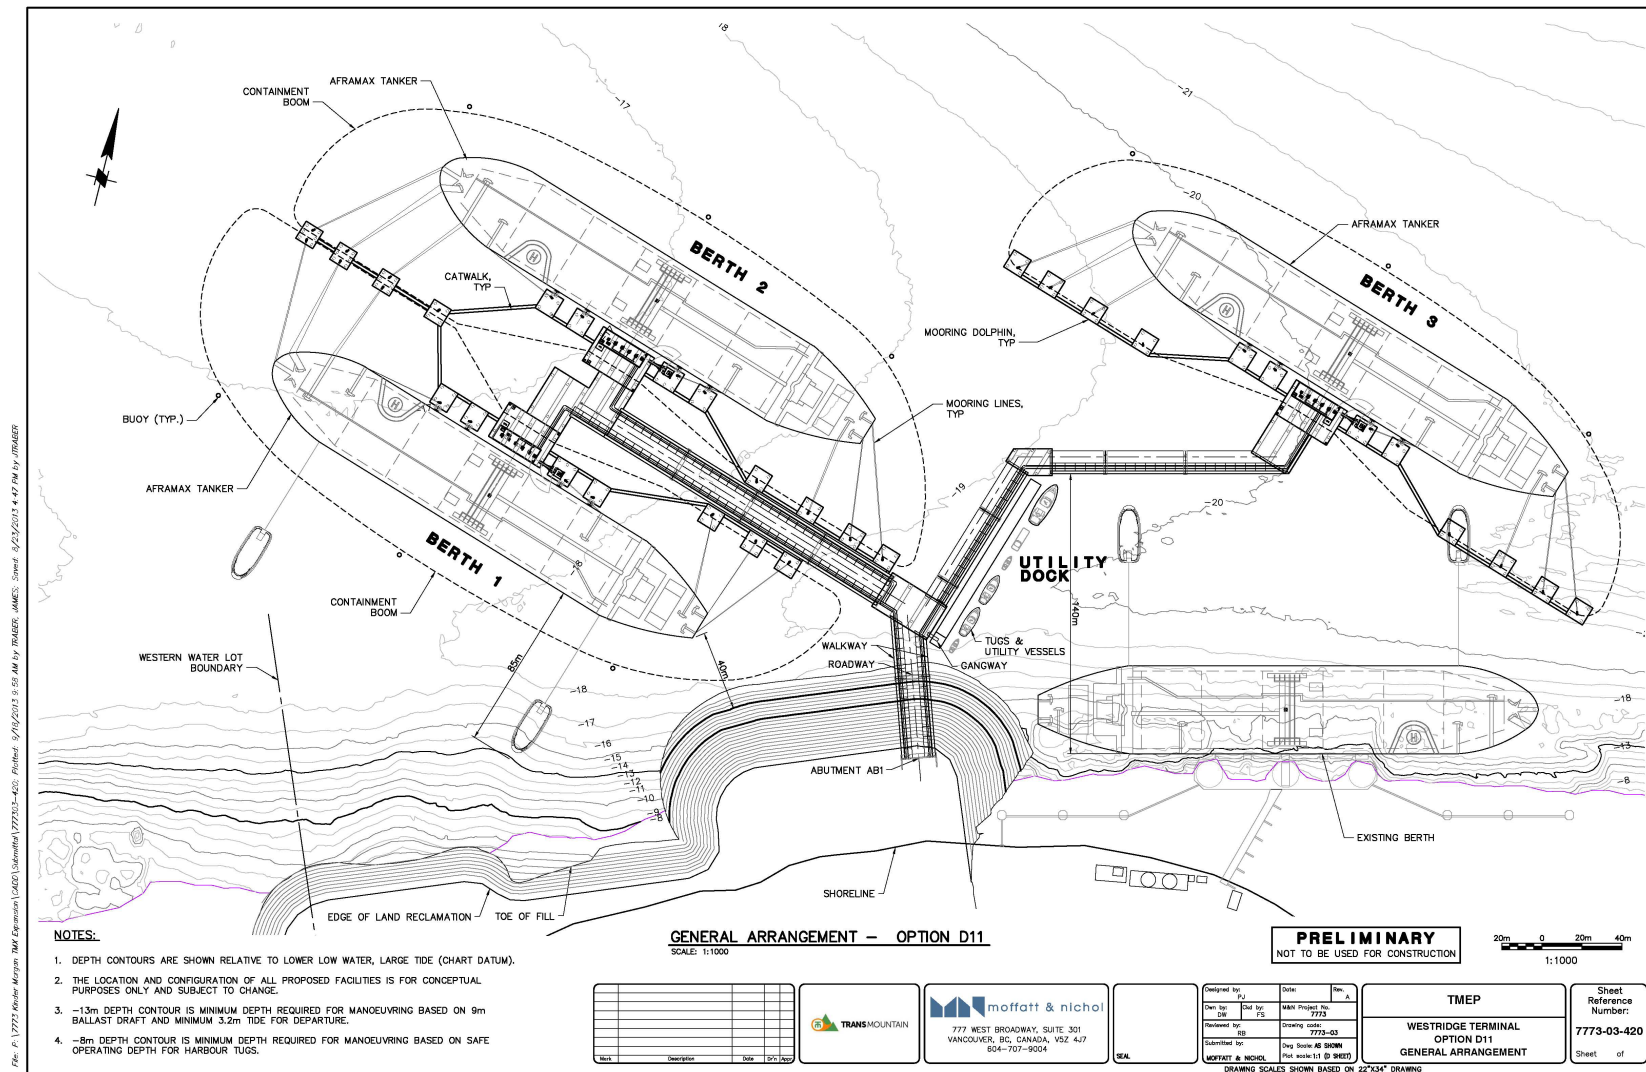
Westridge Marine Terminal Proposed Dock Plan
